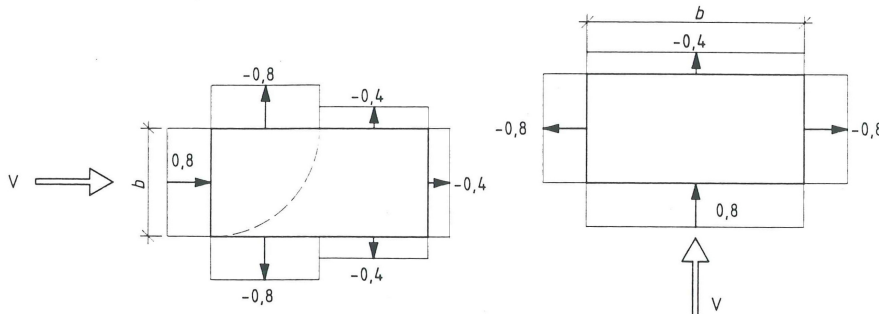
wind type factors on vertical walls (for structural elements > 10 m²) (from: NEN 6702)
